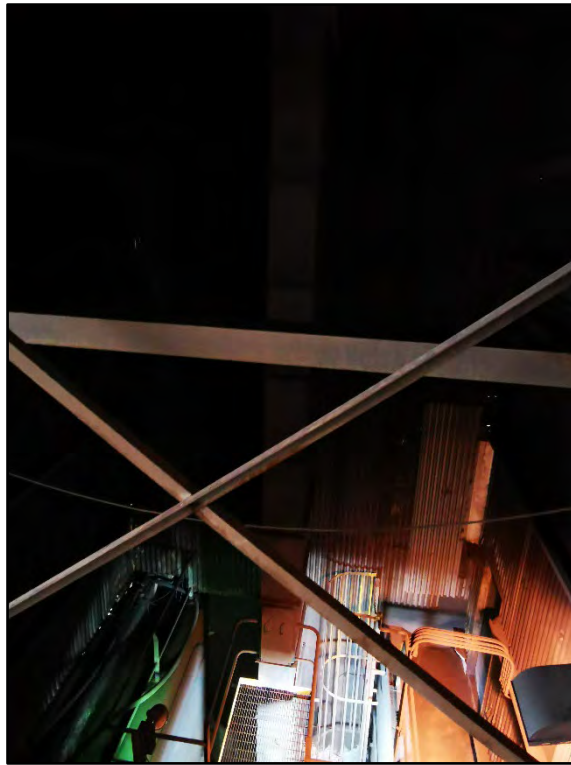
Surface Corrosion of Purlins, Rafters, Bracing and Roof Sheetting
